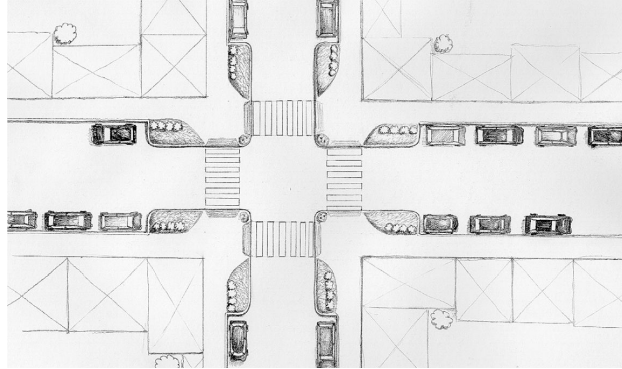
Diagram of pedestrian crossing shortening by raised pavement surfaces
